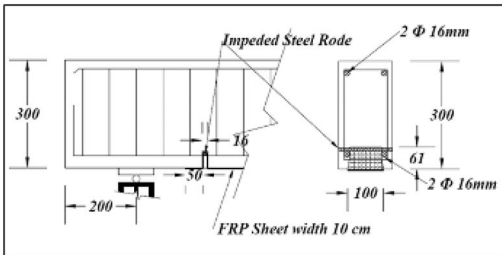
Beam strengthened with CFRP sheets wrapped on horizontal drilled bar (all dimensions in mm).
